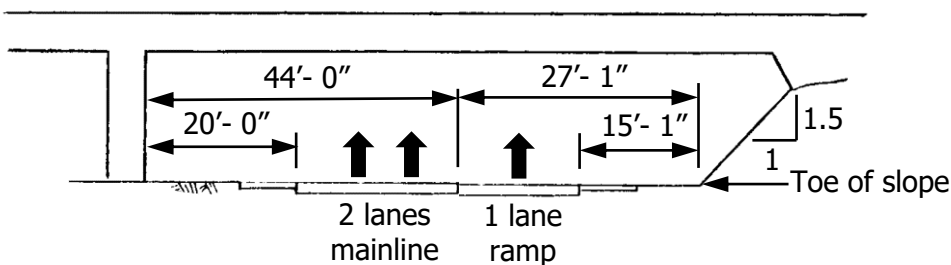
Bridge elevation view of horizontal clearances for highway feature carrying mainline and ramp traffic below the bridge.
